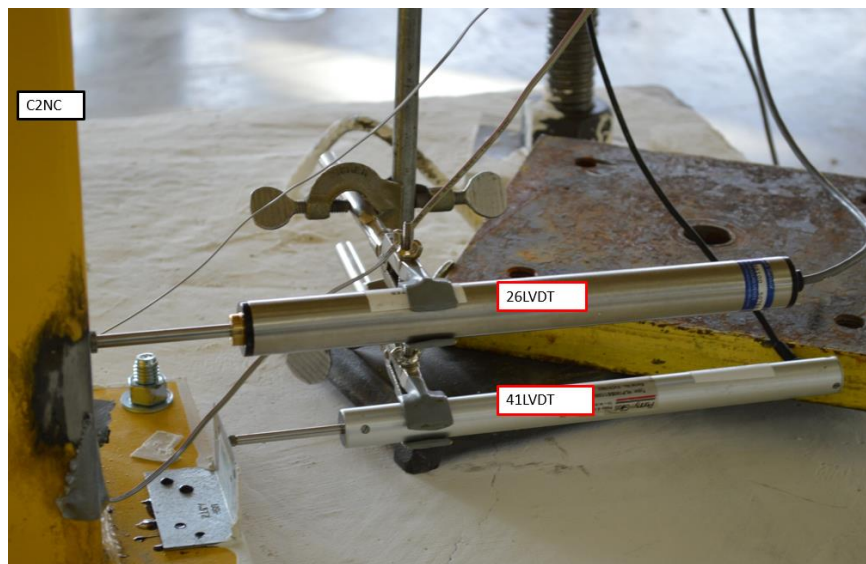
COLUMN C2NC LVDT SENSORS AT BASE
